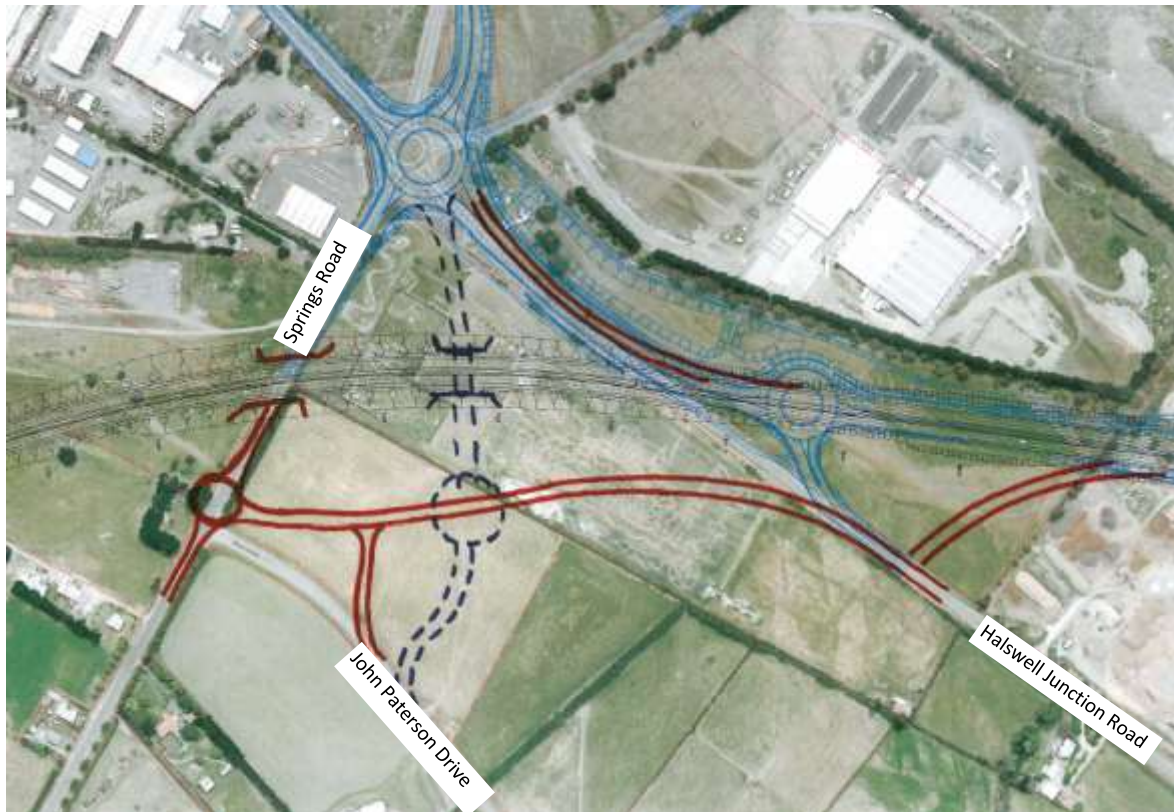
Sketch of alternative layout at Springs Road/ Halswell - main alignment elevated
